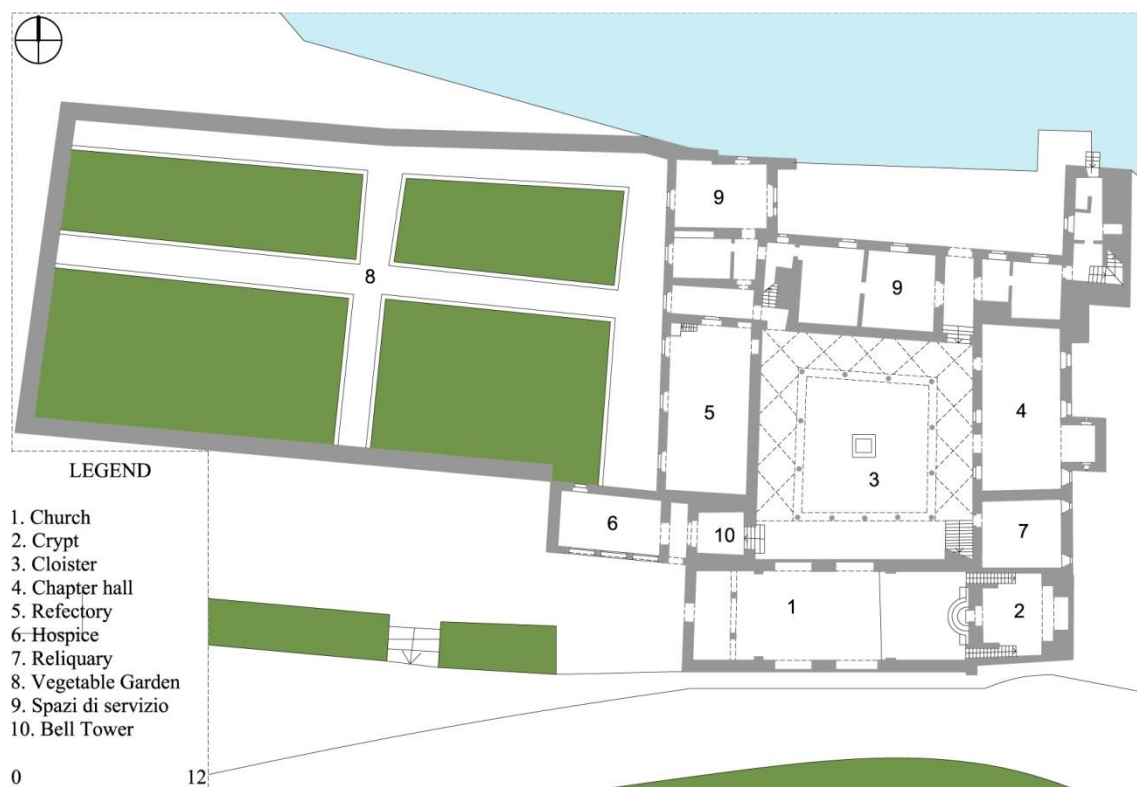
Graphic elaboration of the general plan, elevation + 1.50 m.
